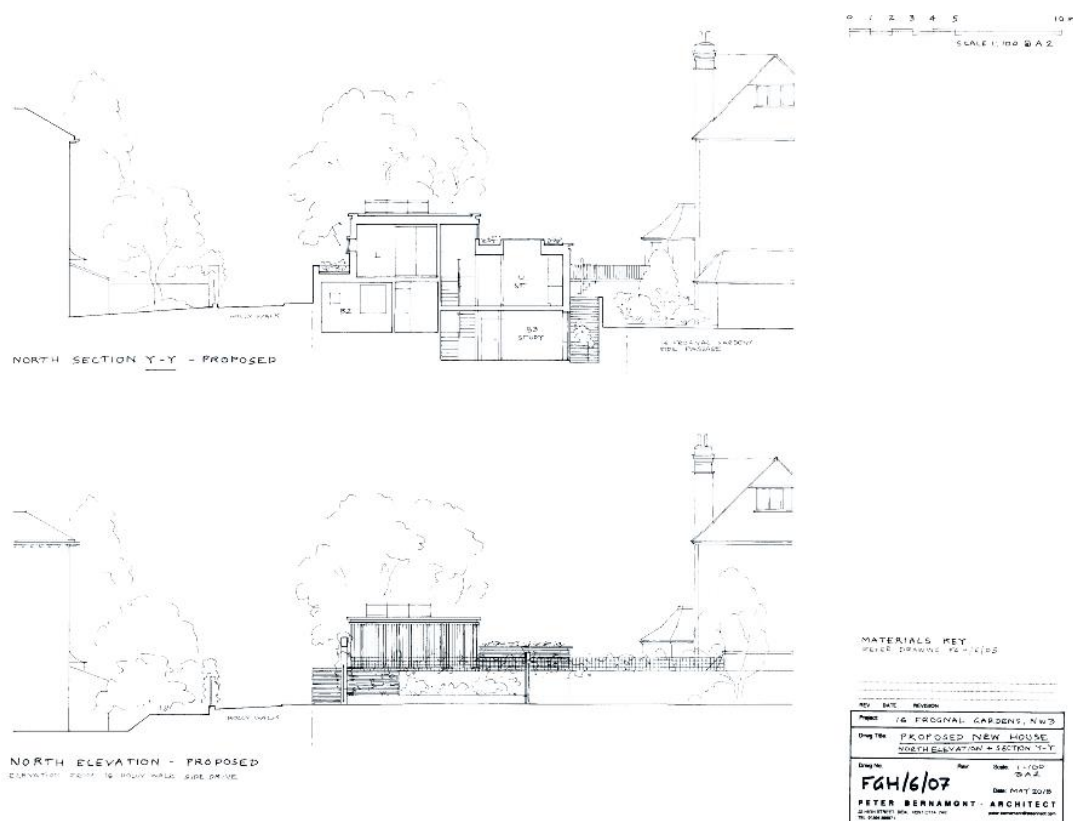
Elevations of proposed Froggnal Gardens residential development
